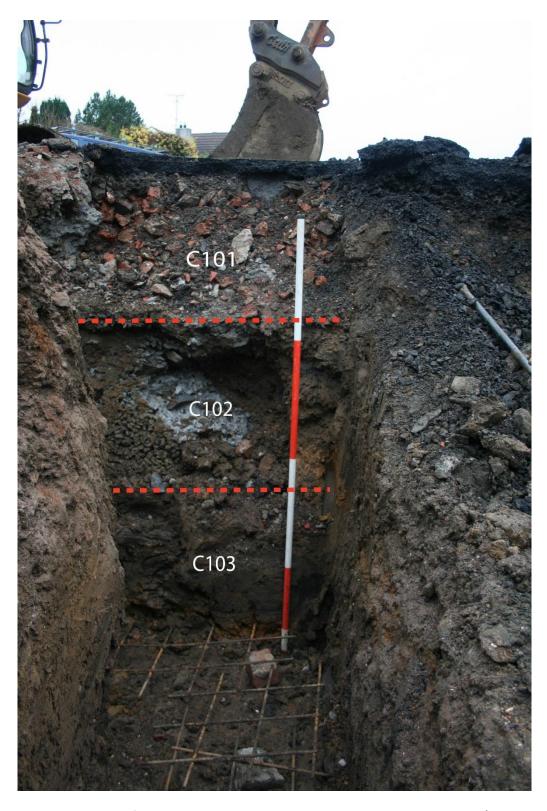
Deepest foundation cut, illustrating stratigraphic sequence on site (looking west)
